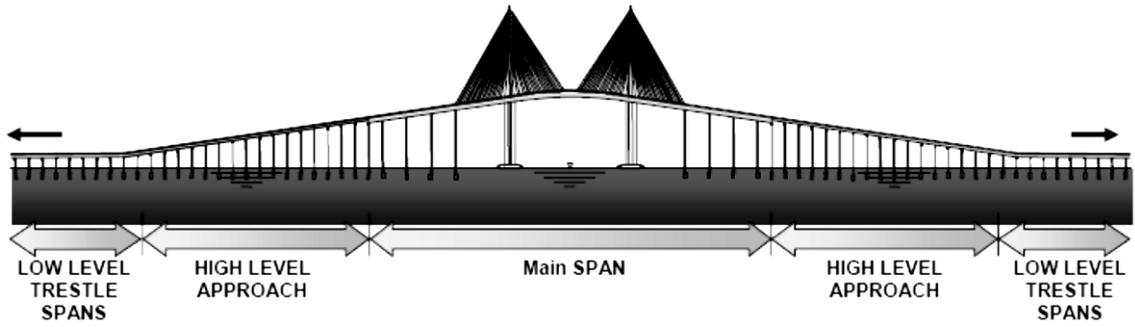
Sunshine Skyway Bridge (ID-11) geometry (Sayers, 2007).
